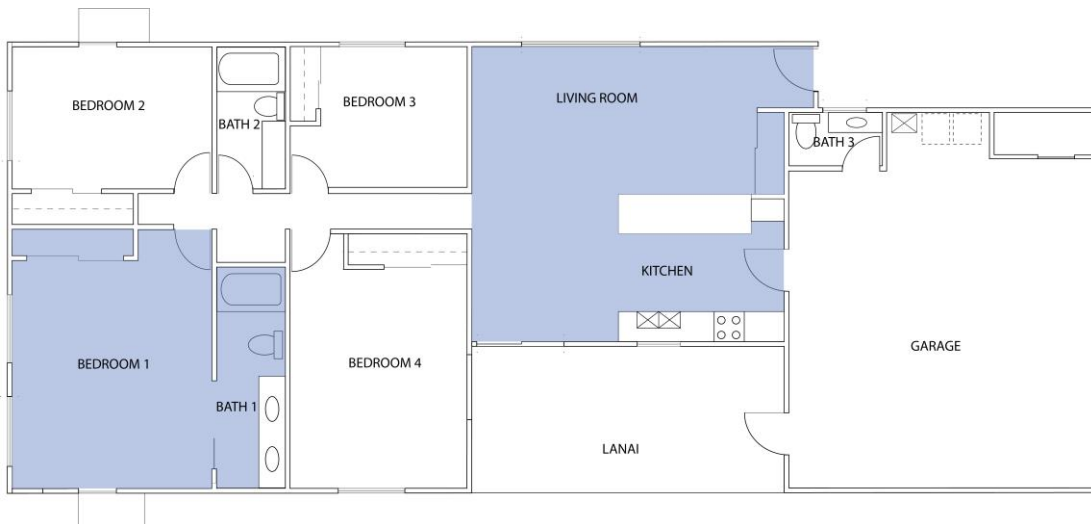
Floor plan of House 8, highlighted blue area are conditioned spaces.
